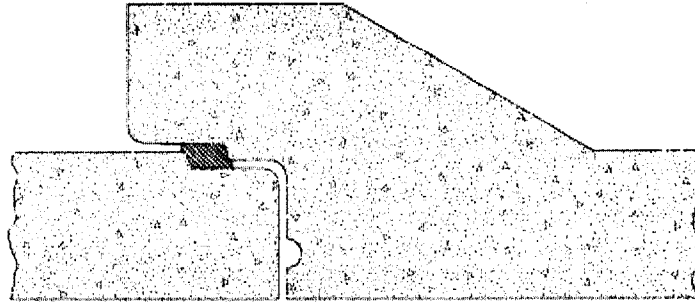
Typical cross sections of opposing shoulder type joint with O-ring gasket
